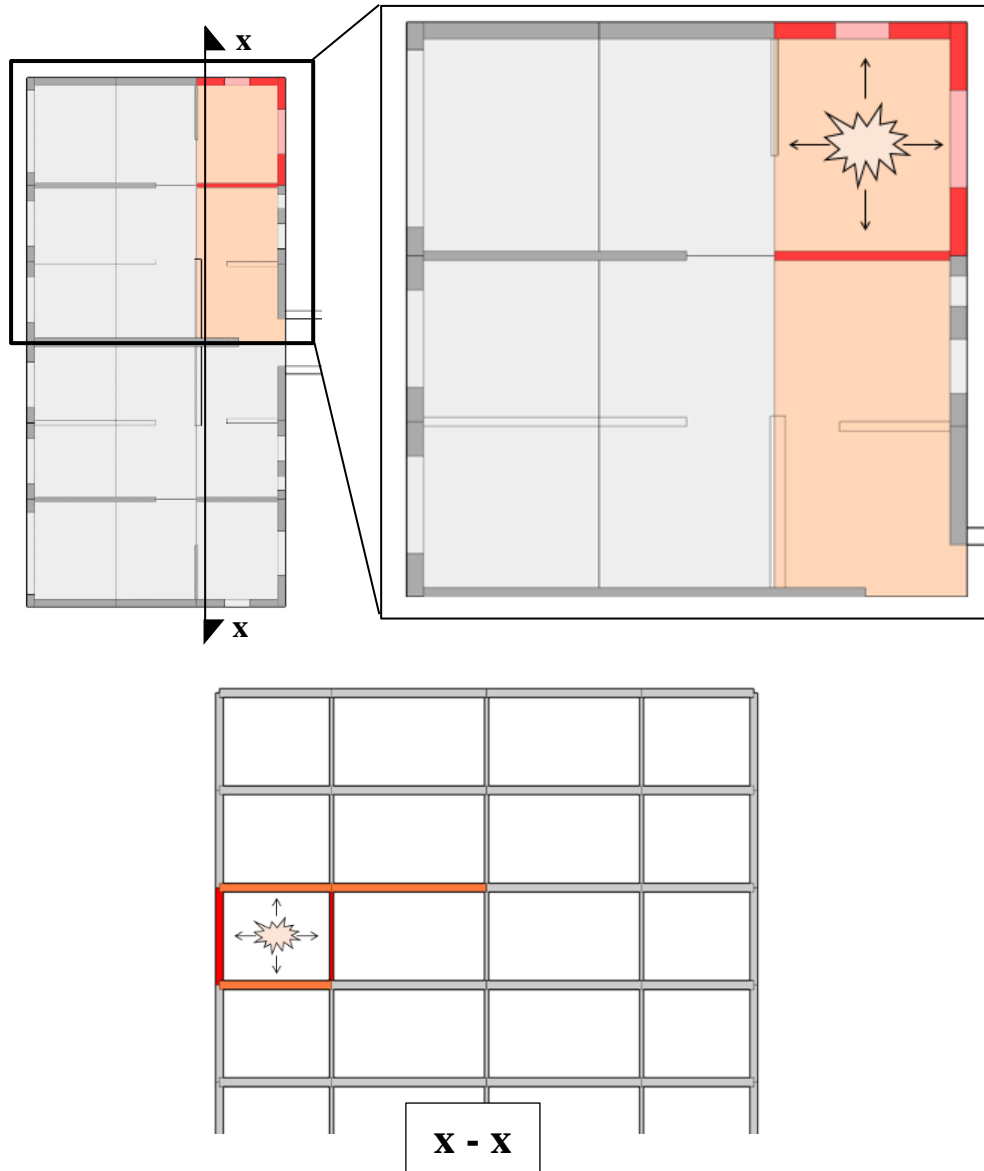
Plan view (above) and section view (below). The walls affected by an explosion occurring in the kitchen are highlighted in red. The affected floor slabs are highlighted in orange.
